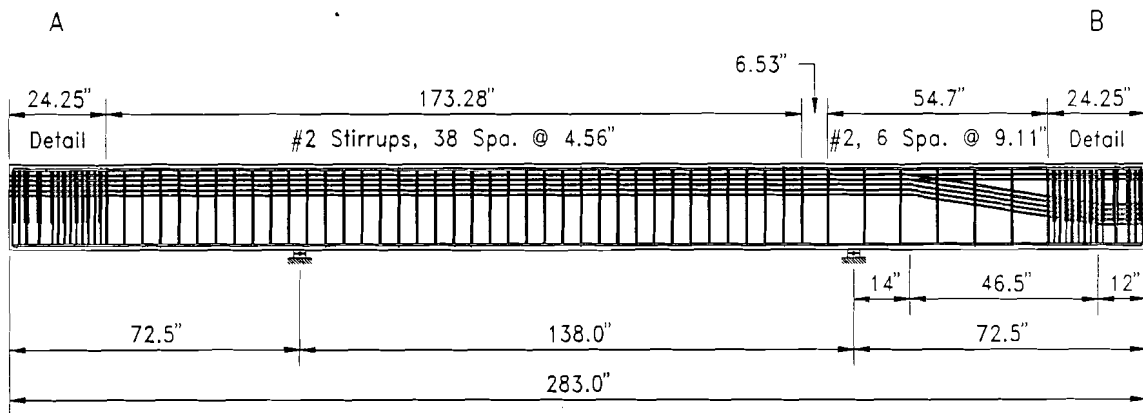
Beam 2B dimensions, stirrup locations, and tendon drape points.
